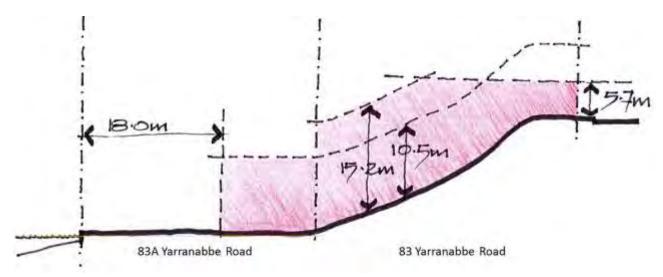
Proposed building envelope for multi dwelling housing or RFB development.
